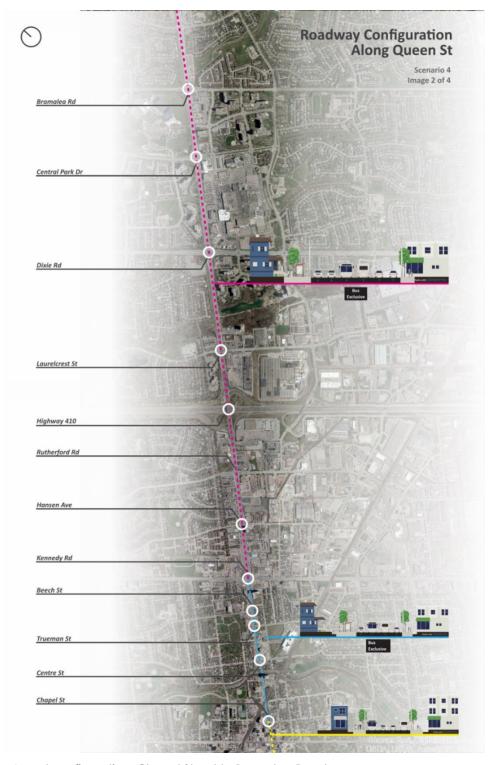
Scenario 4 road configuration, Chapel Street to Bramalea Road
